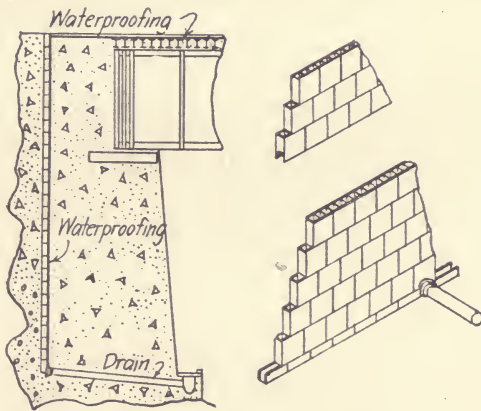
Draining and Waterproofing Tunnel Wall.
